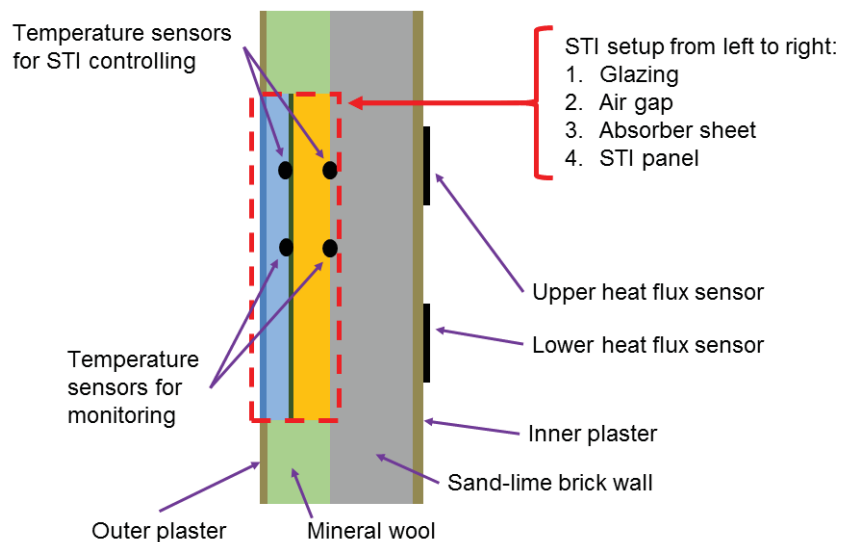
Sketched cross-section of the real STI setup with massive wall and surrounding thermal insulation and plaster.
